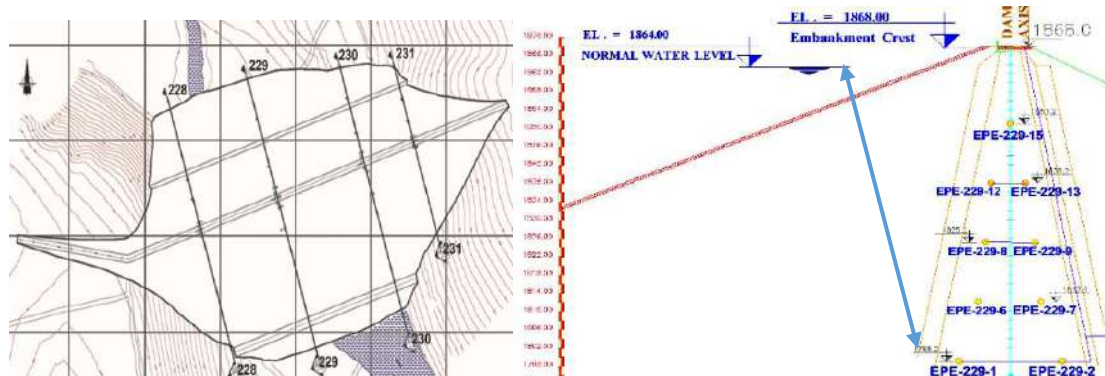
Position of the instrument on the plan and maximum cross-section of the Eyvashan earth dam
